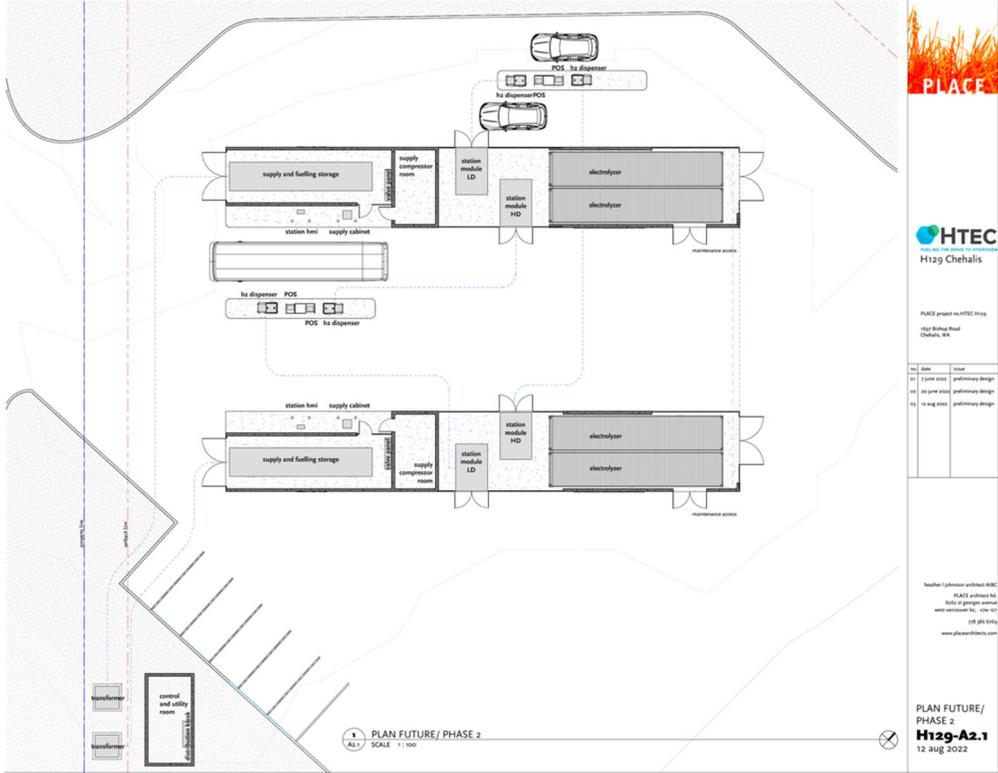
Phase 2 - Proposed equipment location at a greenfield site at 1697 Bishop Road, Lewis County, WA, USA.
